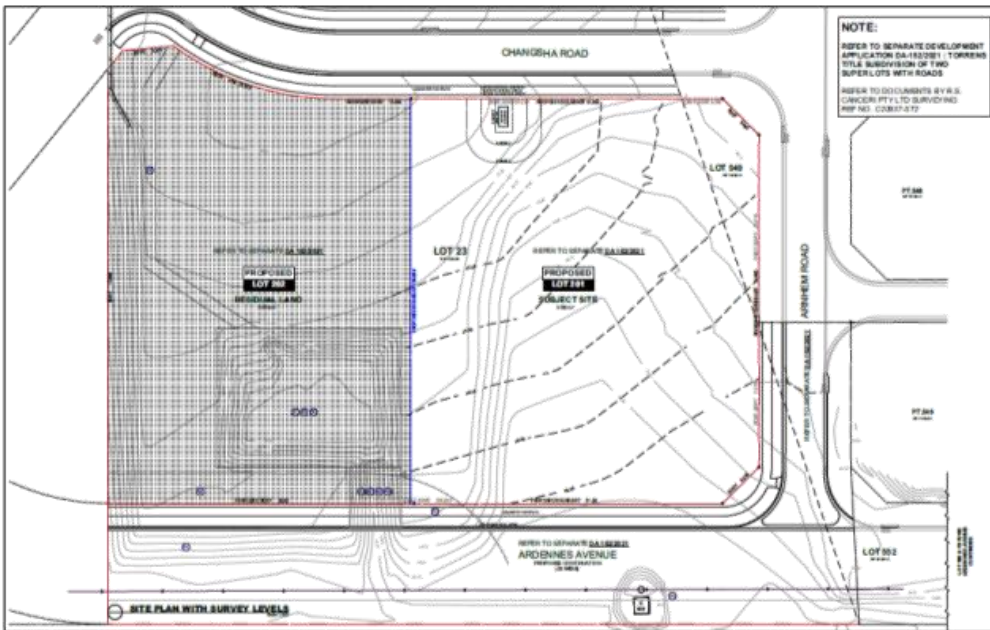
Extract of Site Subdivision Plan (as per DA-182/2021)
